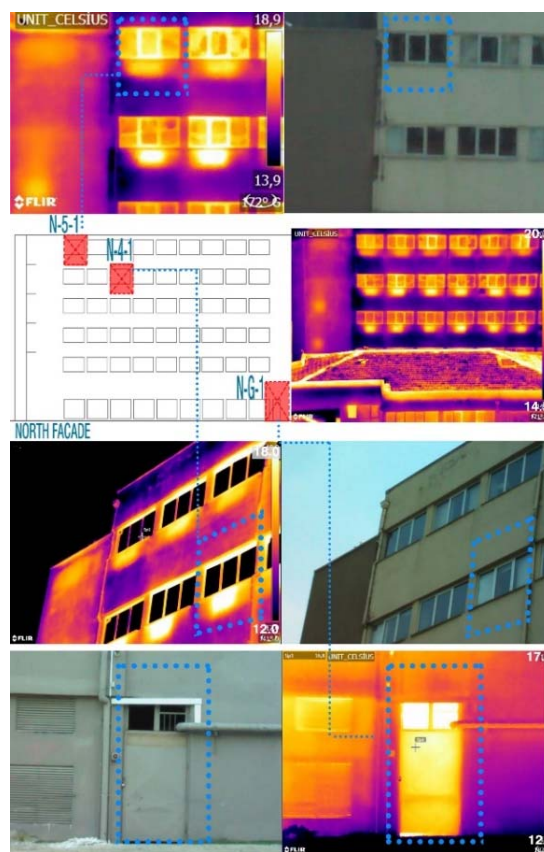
IRT captures on North Elevation of Faculty of Architecture and Design
